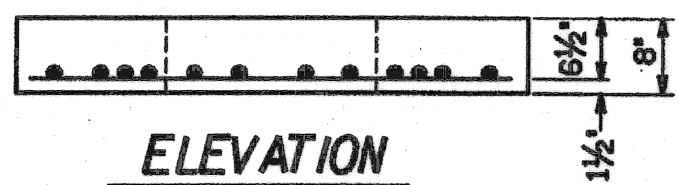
DETAIL FOR JOINING CONDUIT ENCASEMENTS
